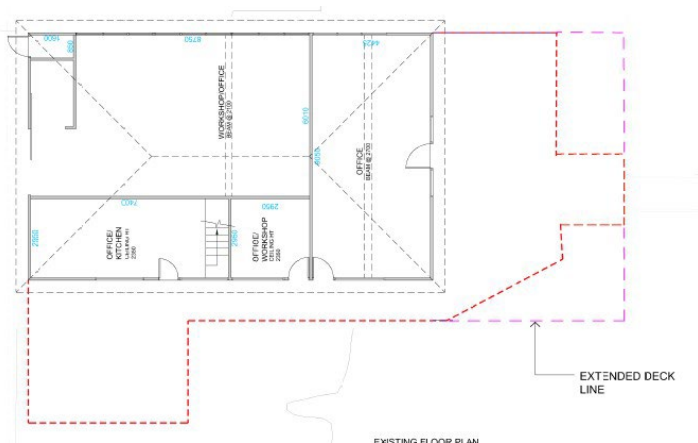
EXISTING MARINA BUILDING FLOOR PLAN AND DECK
